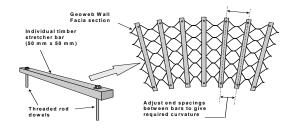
Stretcher Bars for Straight and Curved Wall Sections
